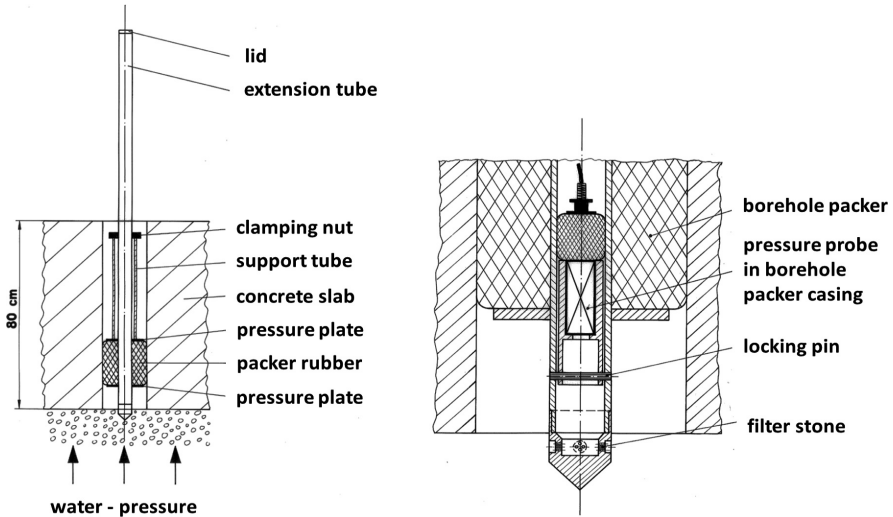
Borehole packer (left) and measuring packer installed in the borehole packer (right).
